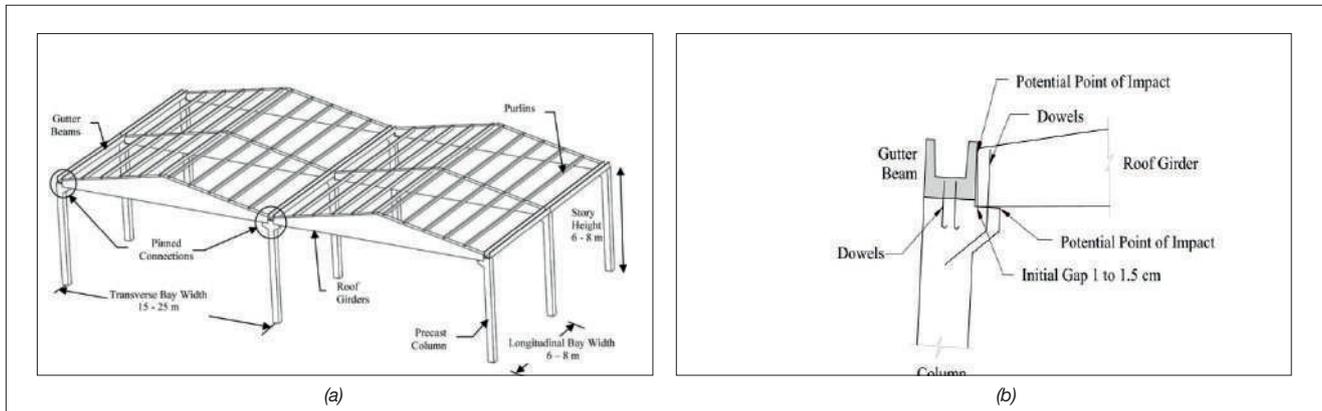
A Turkish typical configuration of one storey precast construction near Kocaeli and details [11-14]
